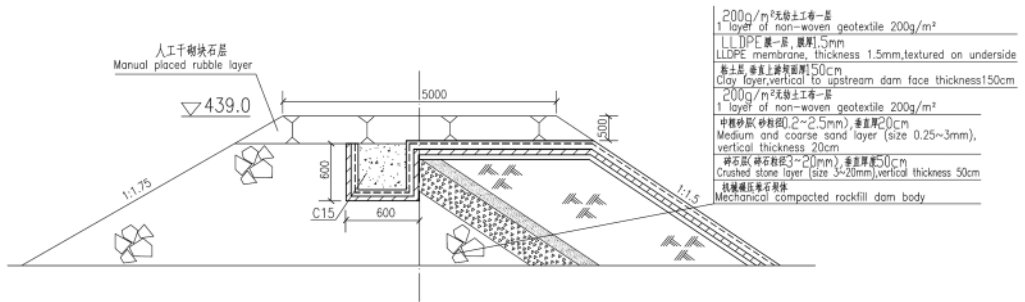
CIL Embankment Construction Detail (NERIN, June 2005)
